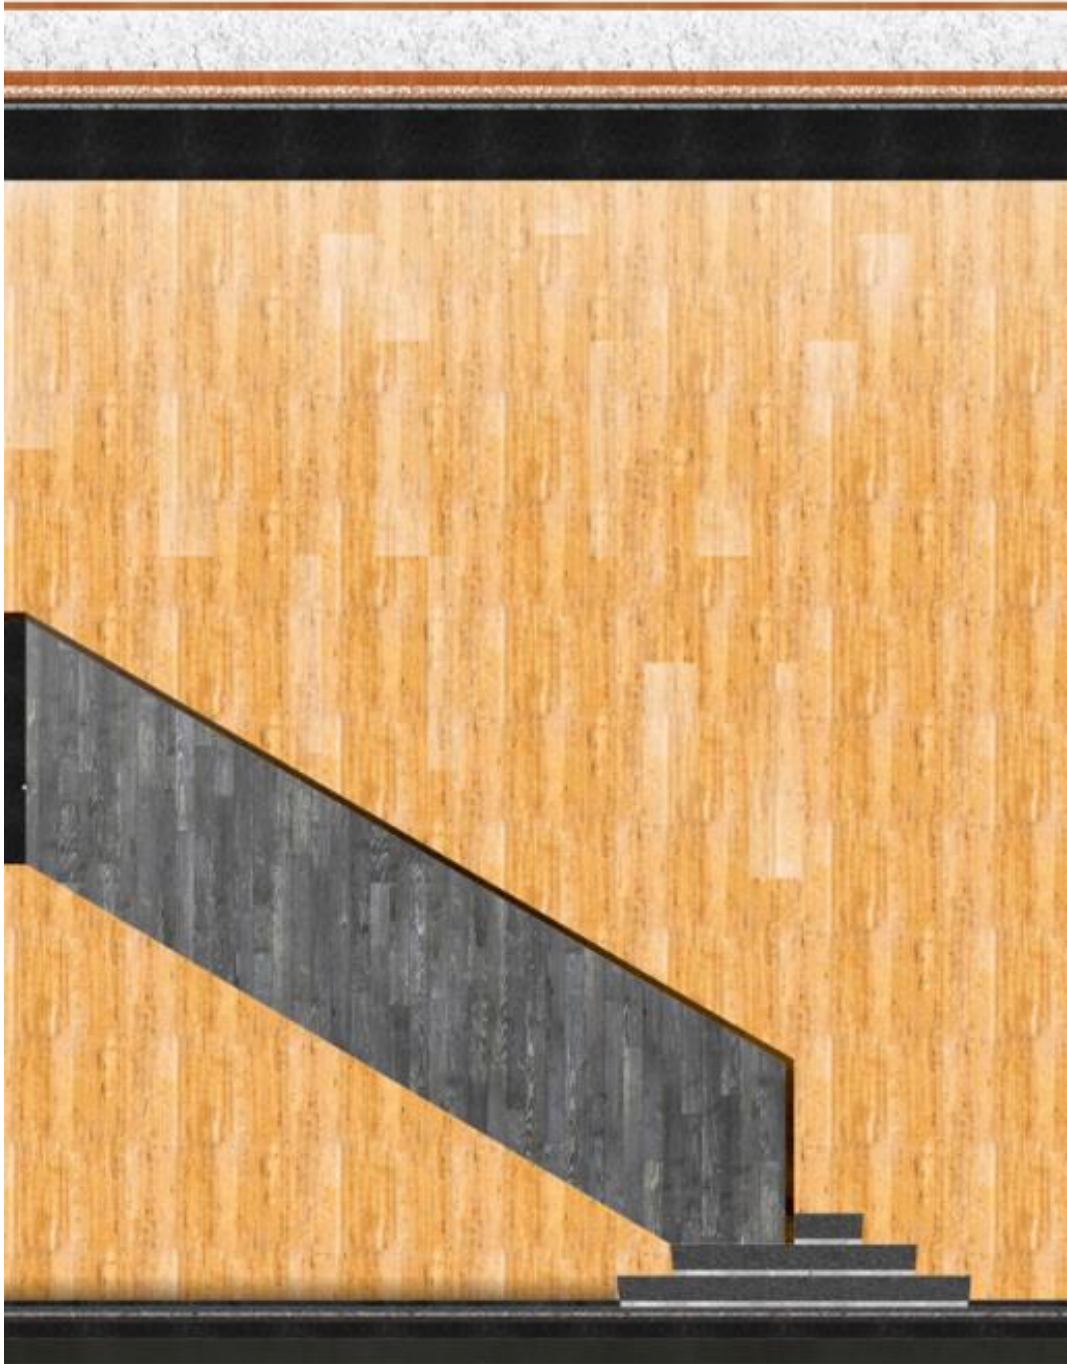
Illustration of staircase in the gallery space composed of beton-brut concrete balustrade with hornbeam railing and precast terrazzo stairs located front of the travertine wall. Similar staircases are applied in the Rectorate building and the School of Mathematics building. (Produced by the Author.)
